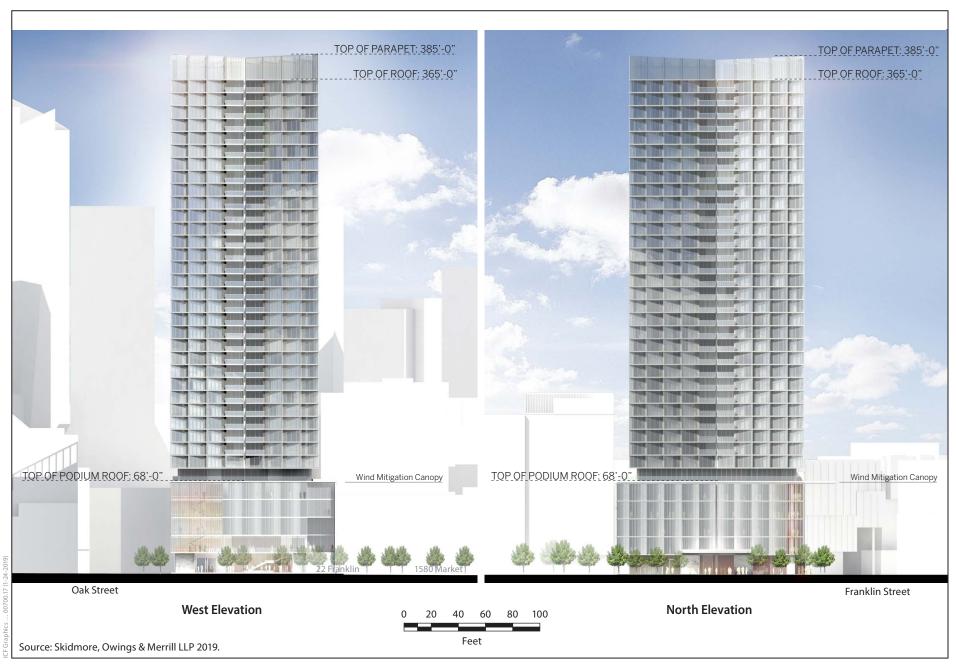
98 Franklin Street Project – Proposed West and North Elevations
